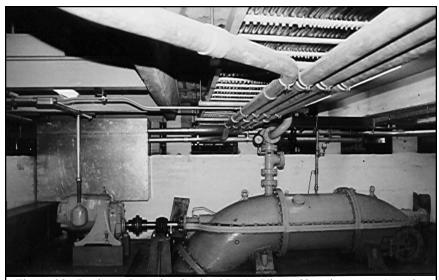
Drainage Pumping Station No. 1. View of interior, central portion of building, showing 30" Wood constant duty screw pump.
